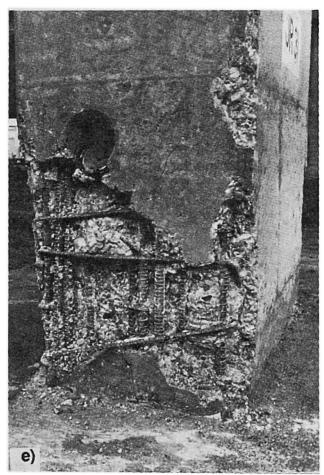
Bridge Damage, Loma Prieta 1989 (M7.1)
